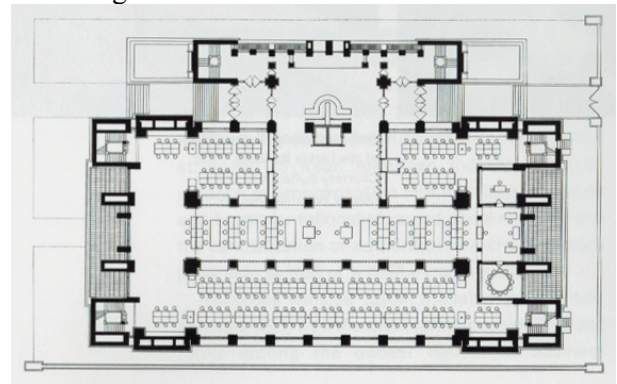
Larkin Building, 1906. Plan, Architect: Frank Lloyd Wright (Source: *Albtecht and Broikos*, 2000: 51).
